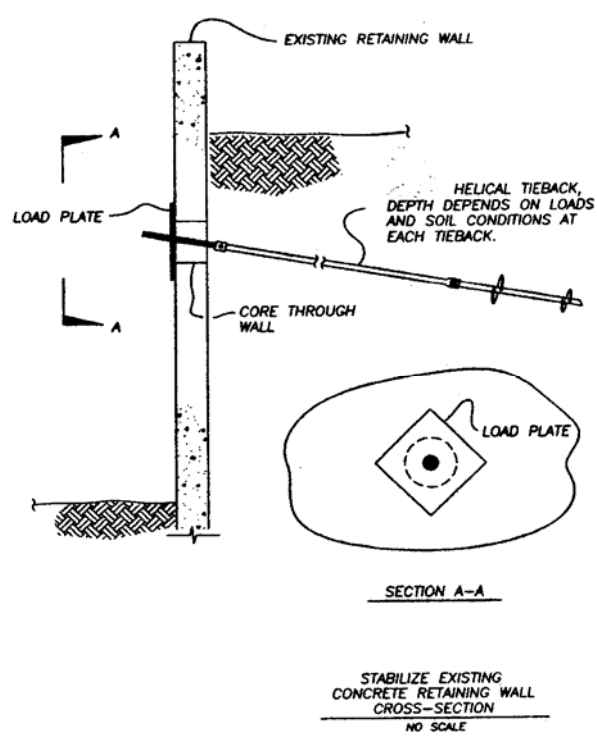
Retaining Wall Repair using Helical Tieback and Load Plate
